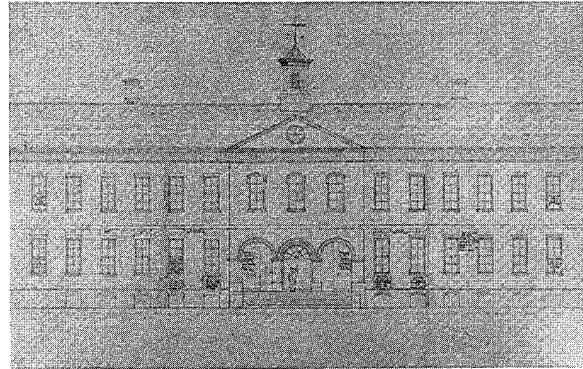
Perry, Shaw, and Hepburn, *Conjectural Elevation of East Façade, The College of William and Mary, print, 1928–1929, Colonial Williamsburg Foundation.
